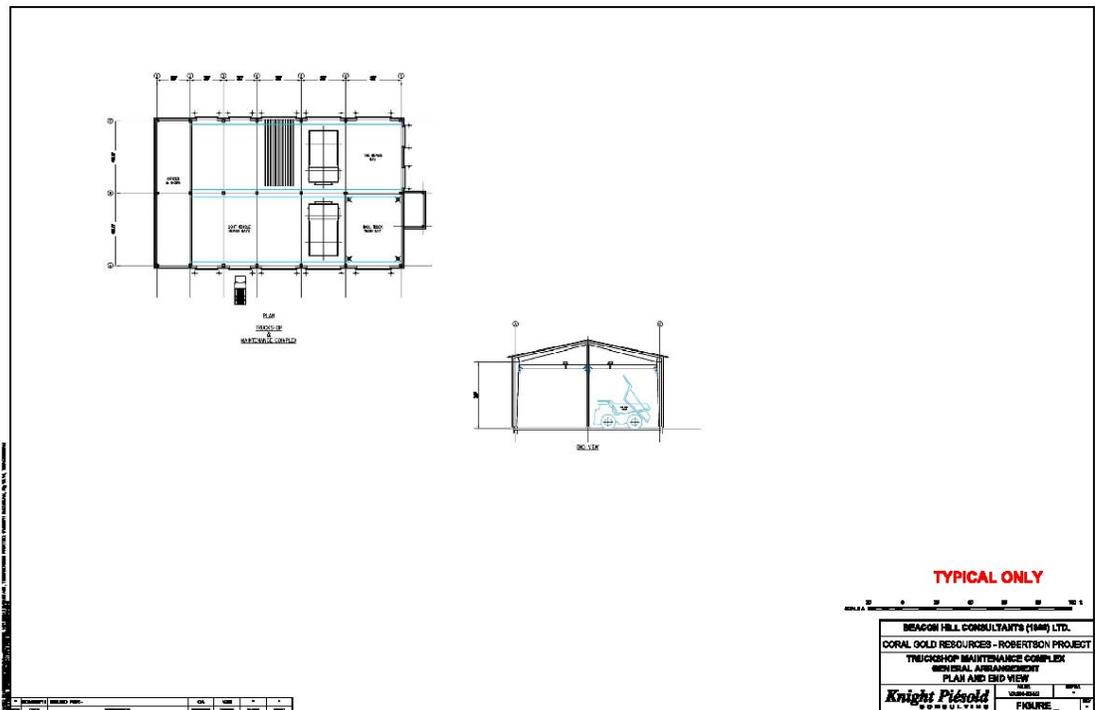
Truckshop Maintenance Complex – General Arrangement Plan and End View
